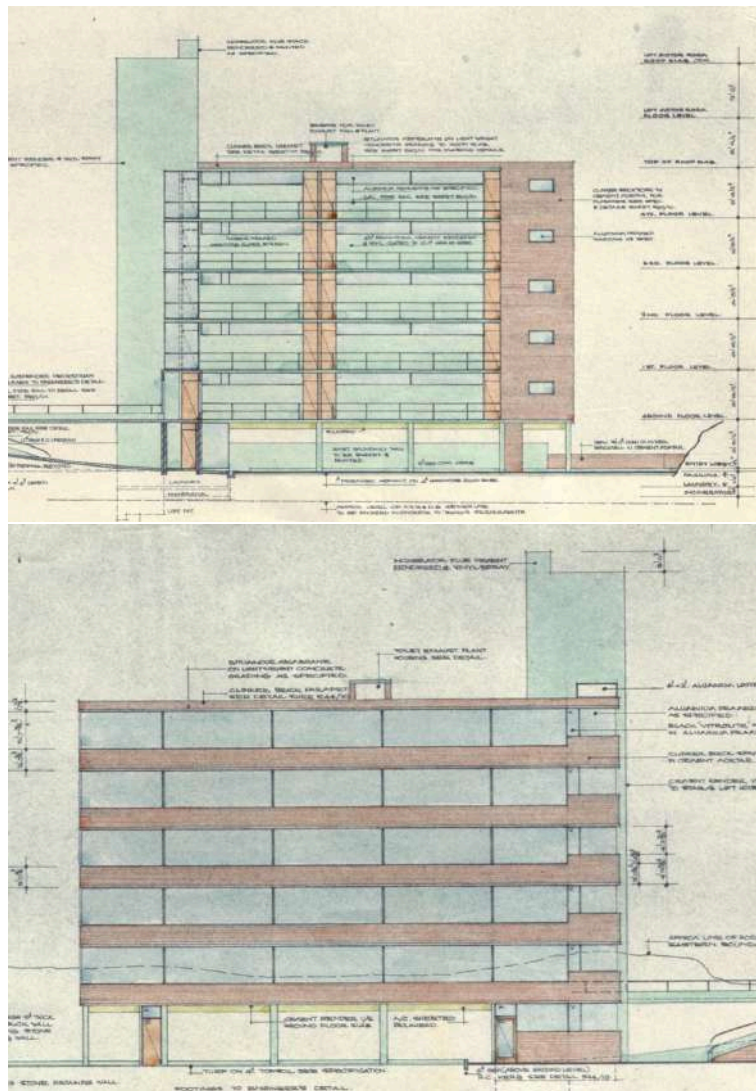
80 Elizabeth Bay Road, original floor plans by Oser Fombertaux & Associates dated September 1963. Elevations
